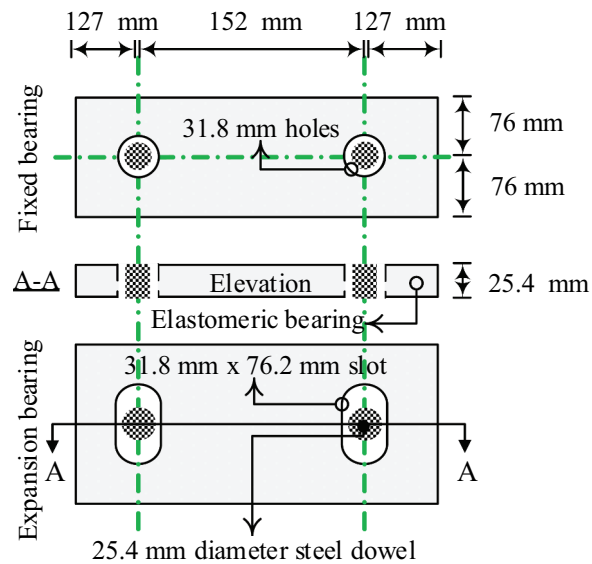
Plan and elevation view of the fixed and expansion bearings with steel dowels.
